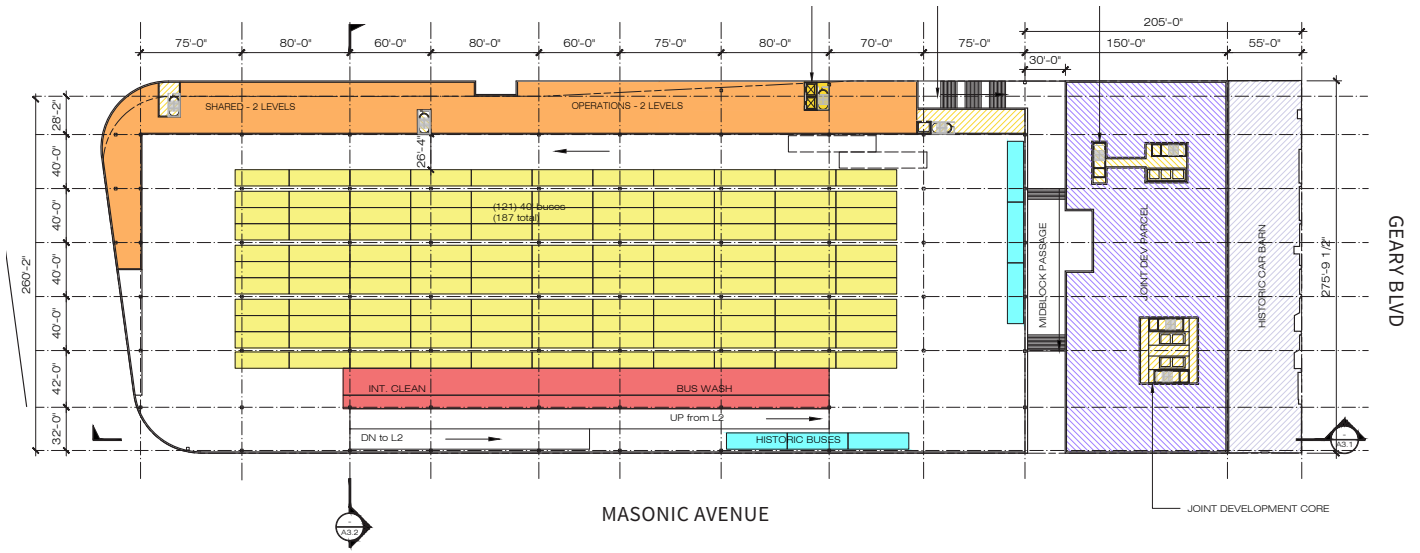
BUS FACILITY CONCEPT DESIGN - THIRD LEVEL PLAN
